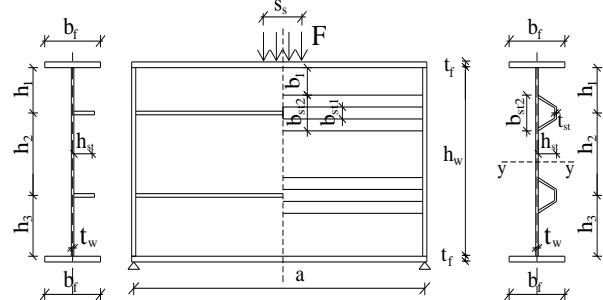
Used geometry and investigated structural layouts with open and closed section stiffeners.
